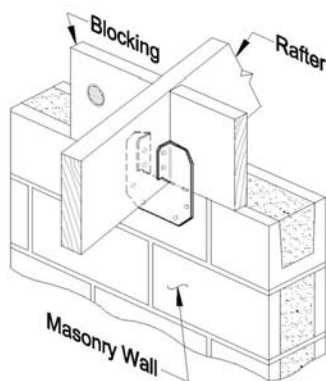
B: Roof to Wall Uplift Resistant Ties for "Single Wall" Construction – Existing Fascia Extending Below Rafter
